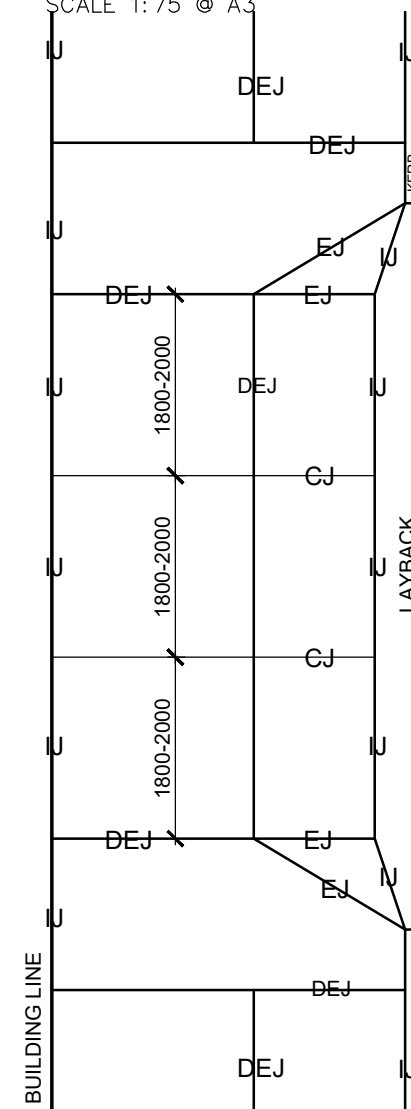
Typical Vehicle Crossing Paving Layout _Secondary Granite Treatment
